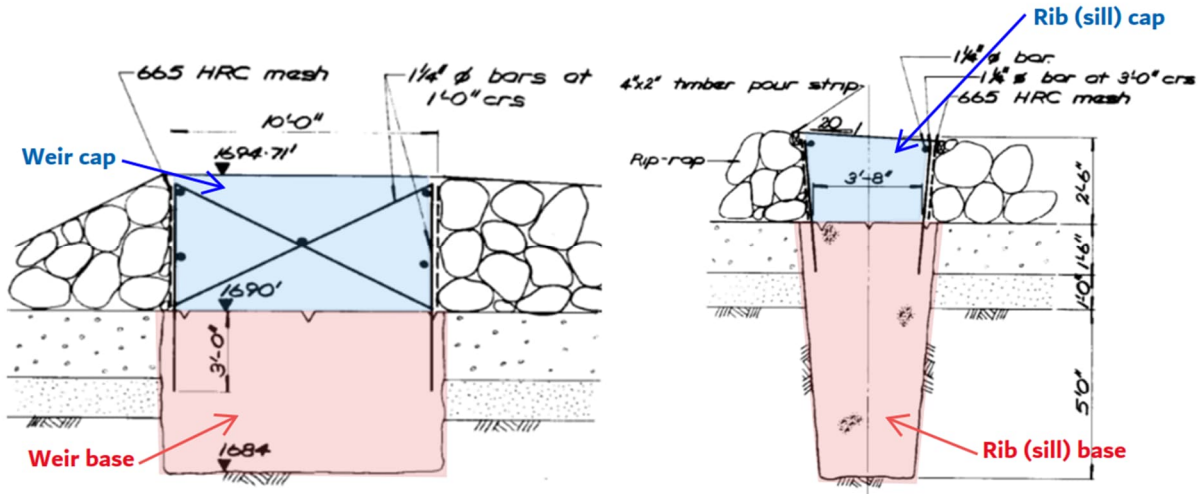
Weir and rib (sill) concrete structure showing the cap and base sections
